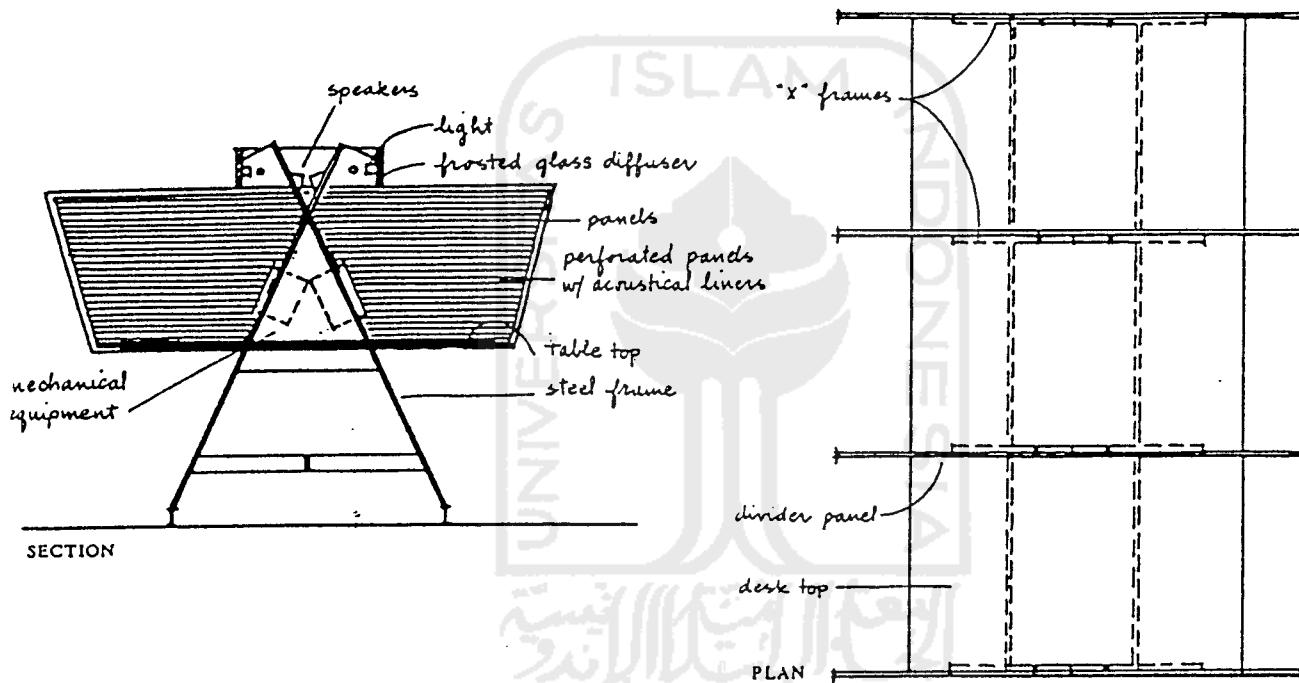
Carrels with mechanical equipment built in, based on a steel or aluminum "X" frame. Frame folds up like a card table, can be used for other purposes as well.
